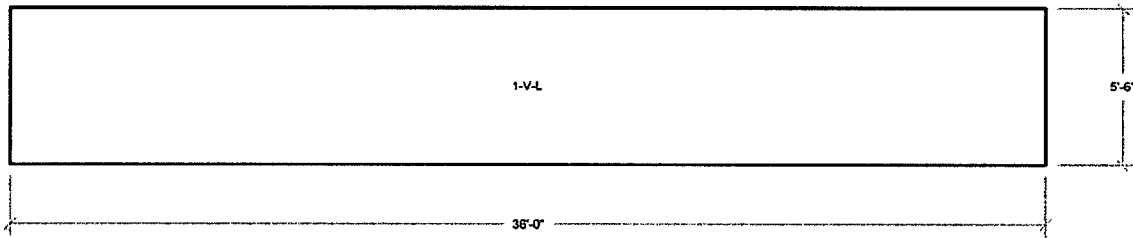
H.7-19: Roof of Tunnel Looking Down Vertical Reinforcement Zones Near Side and Far Side Faces
